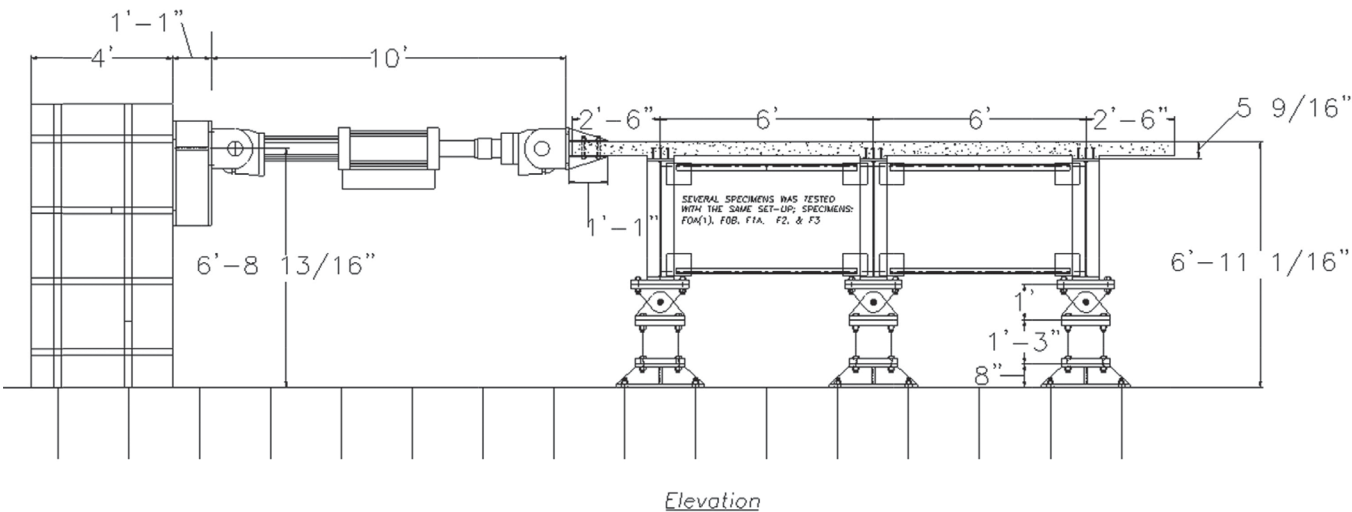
Elevation and dimensions of test setup of specimen F0A.
